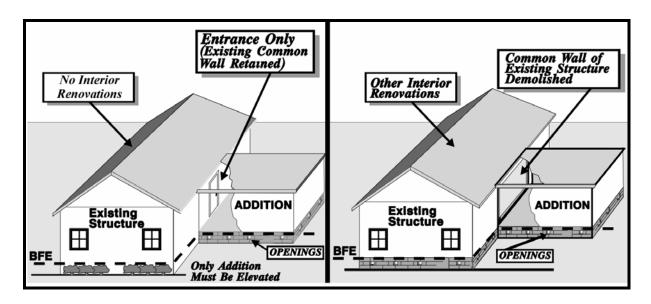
Lateral additions to a residential building. The structure on the left would not benefit from the post-FIRM flood insurance rates because it was not elevated.
